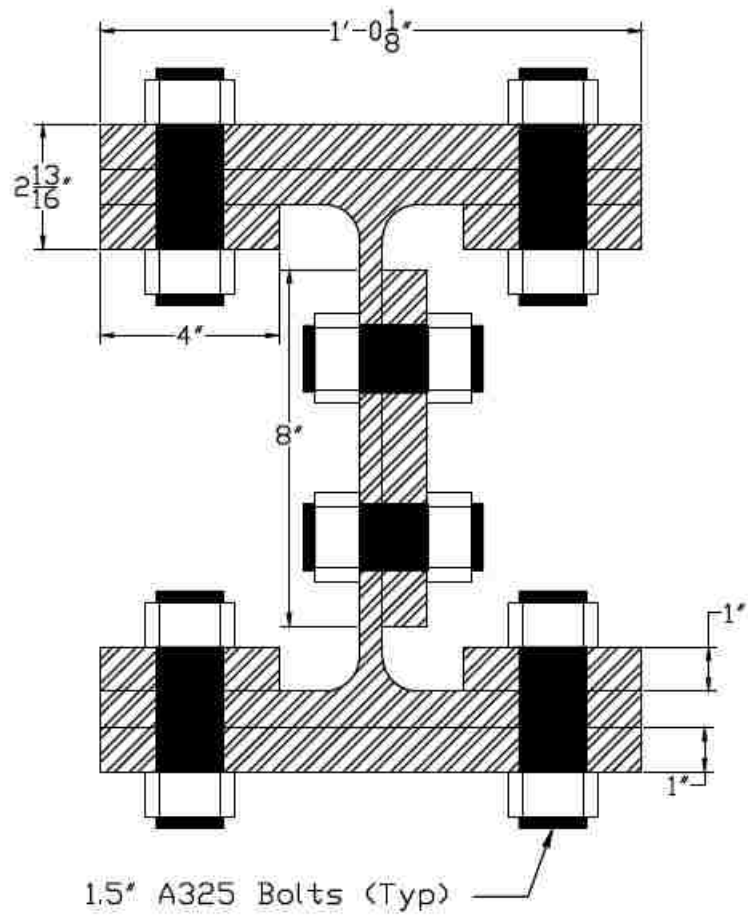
Bracing Frame Repair (Cross Section A-A of Figure 4.34, Bracing Frame Beams Not Shown For Clarity)
